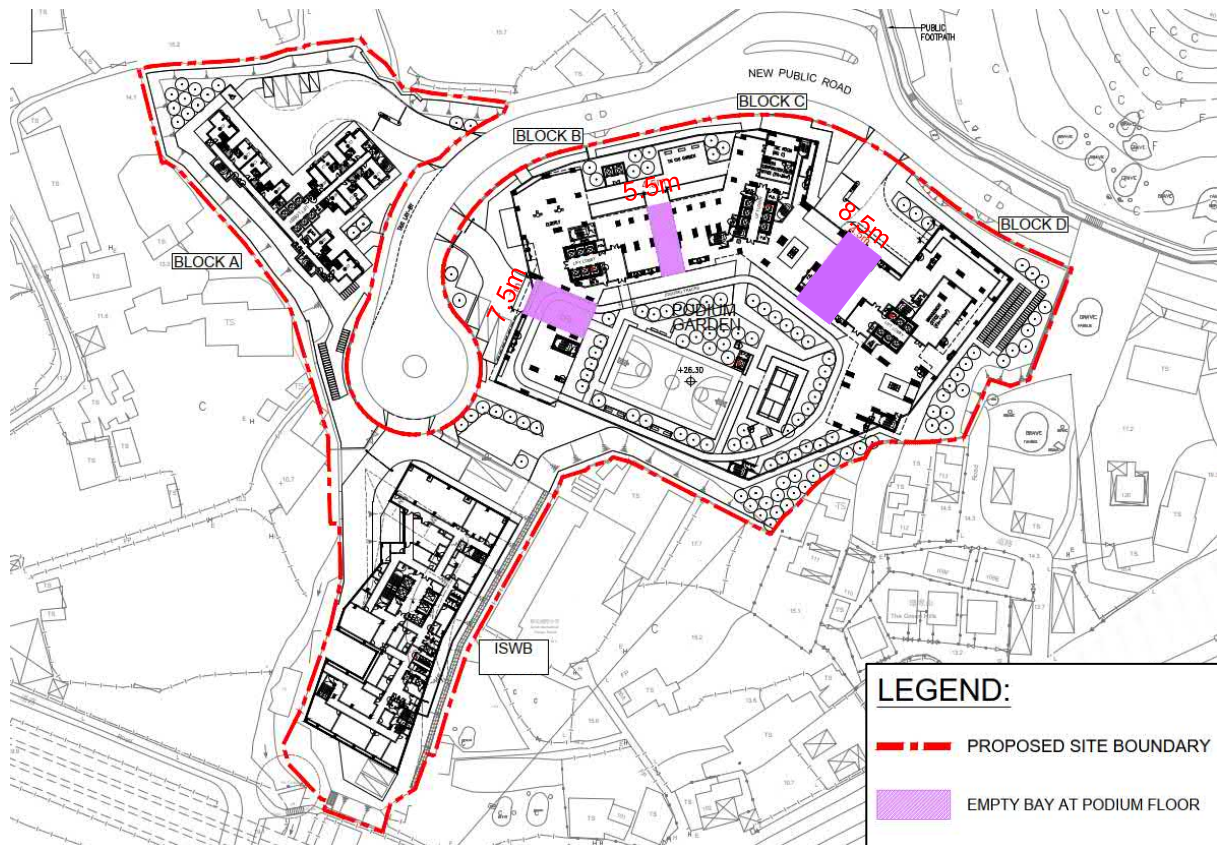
Preliminary Layout of Proposed Scheme at Site B (P2/F)
